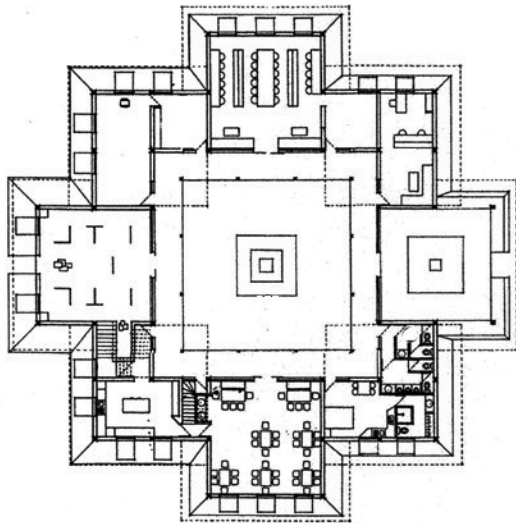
The Pavilion of Tibetan Culture : Ground Floor Plan
